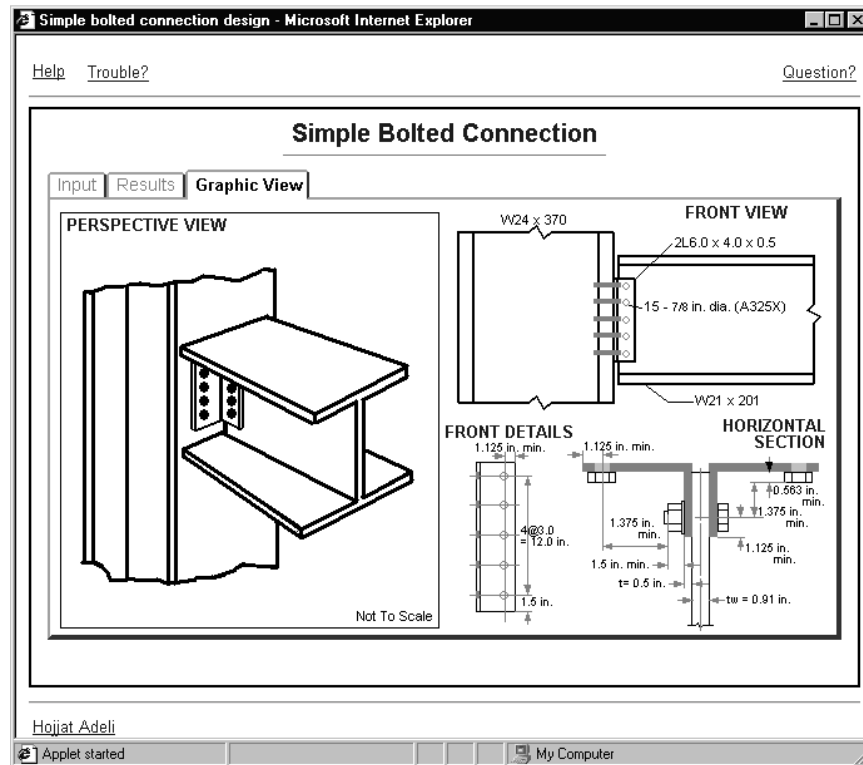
Results panel for the simple bolted beam-to-column connection design
